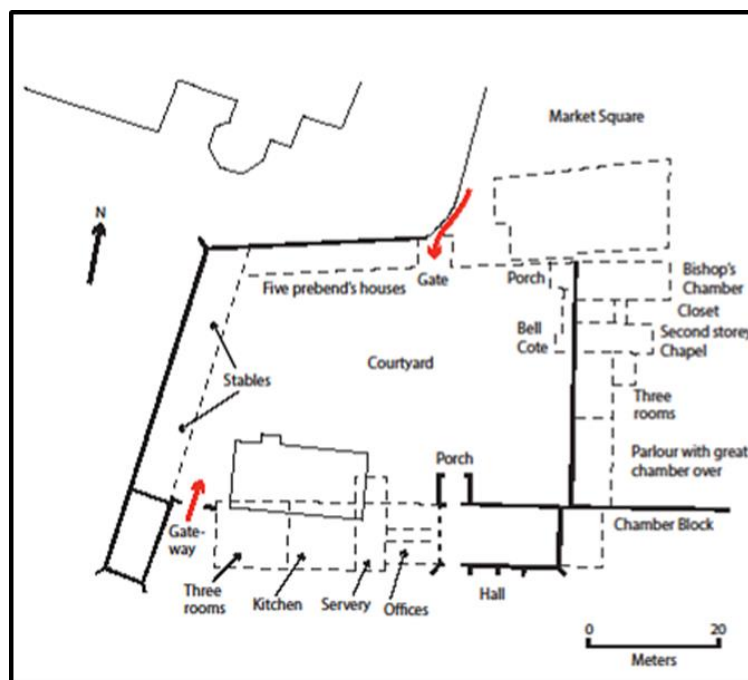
Plan of Howden Manor. Based on plan from Whitwell, 1984.
